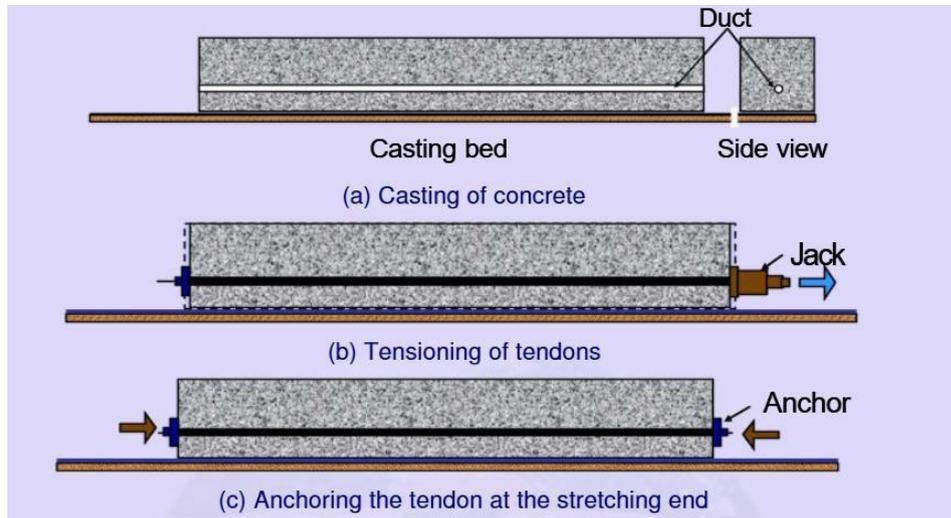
Longitudinal Section of a Prestressed Concrete Girder by Post-tensioning
